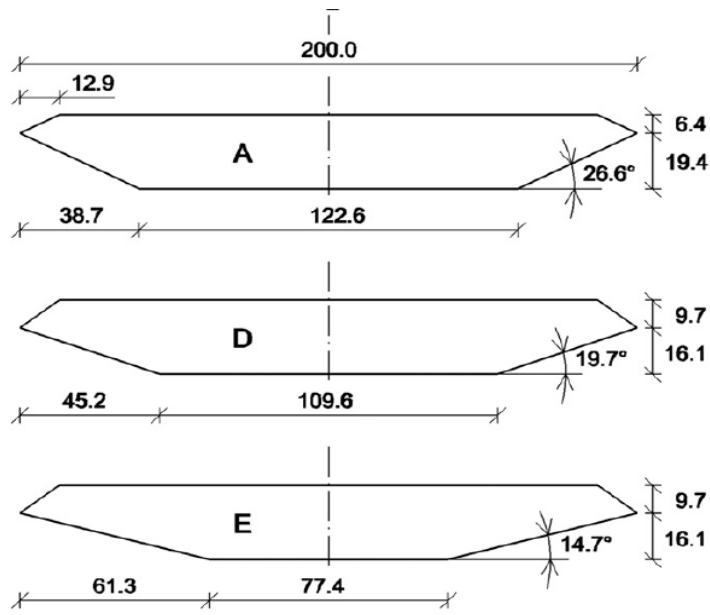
Trapezoidal cross section model of bridge deck with different side angles (26.6°, 19.7°, 14.7°)
